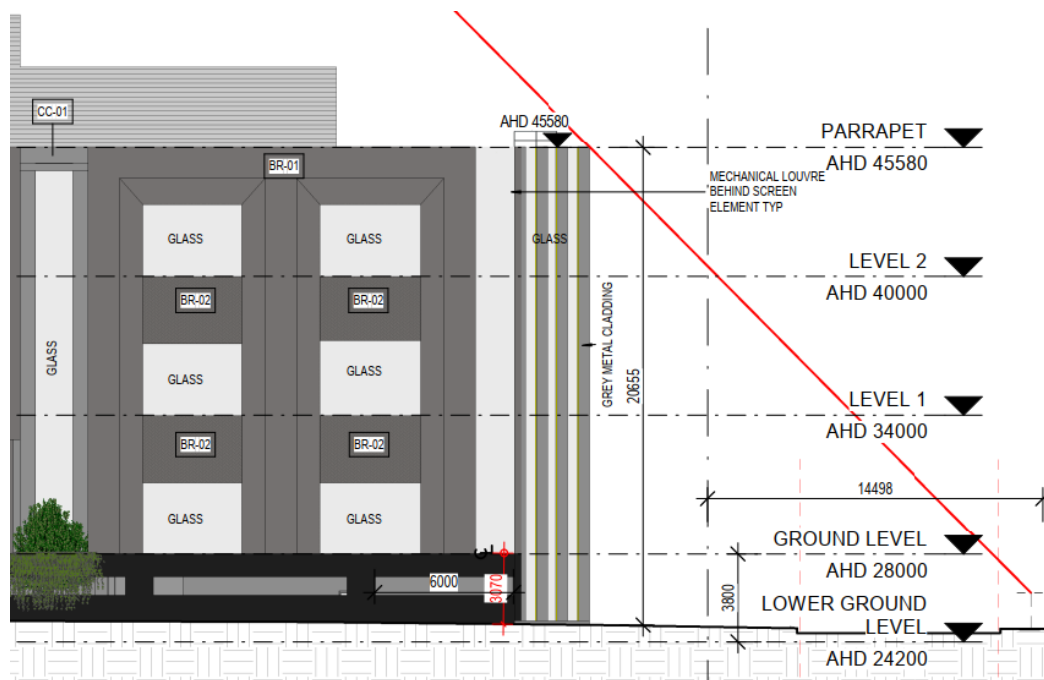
Detail of west elevation (Mcarthur Street) of proposed data centre, with a maximum height dimension of 20.66 metres to Indwe Street.
